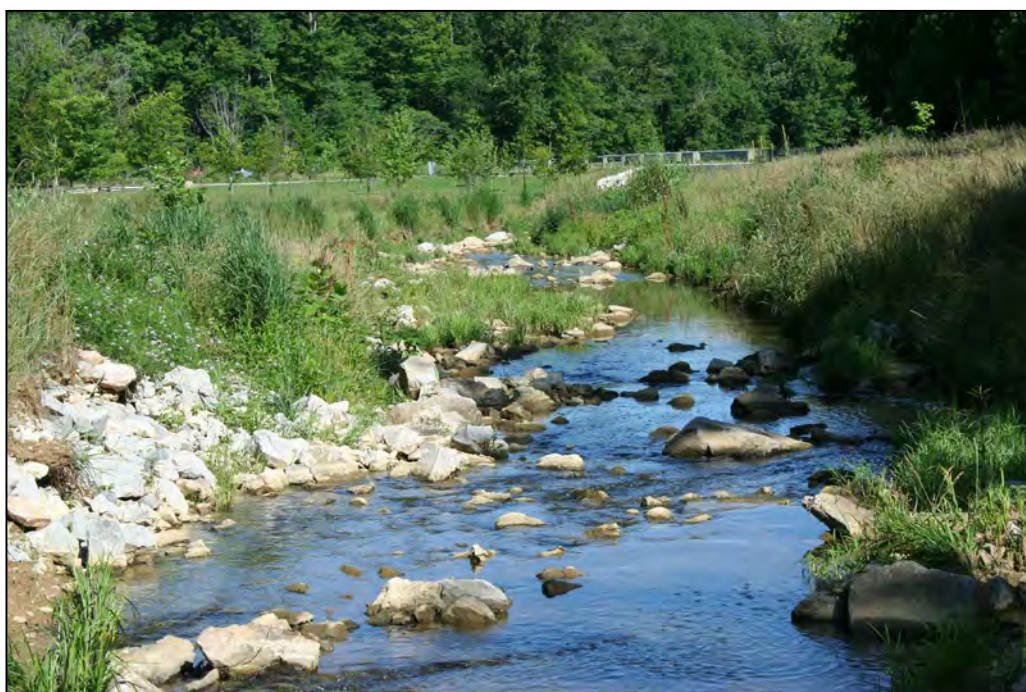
LOCATION 2 - LOOKING NORTHWEST (DOWNSTREAM)
